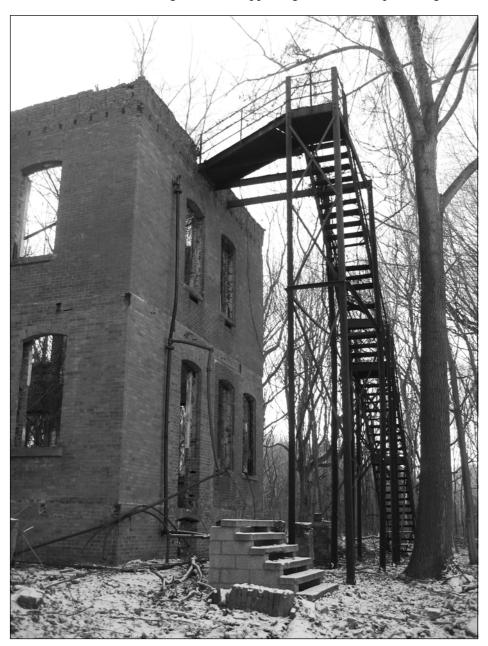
Southwestern corner of rear north wing and interior area, facing east.
